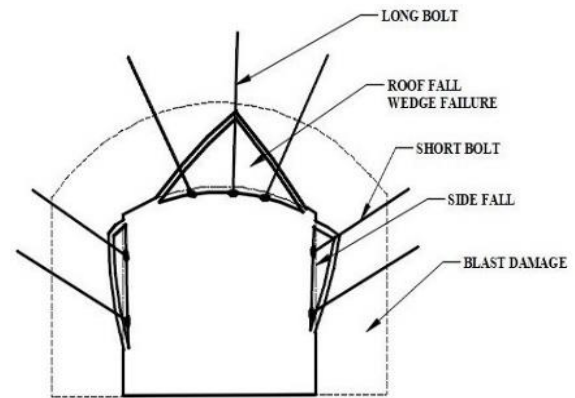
Typical cross-section of Rock-Bolt installation
